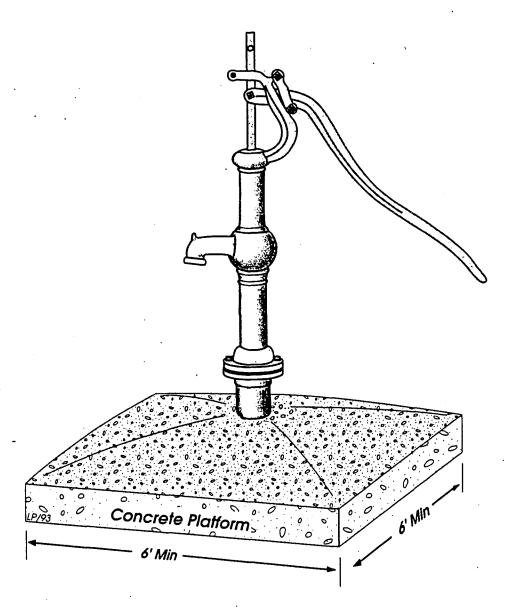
Required watertight concrete pump platform for hand pumps installed outside. The platform shall be mounded so water does not accumulate around the well casing.
